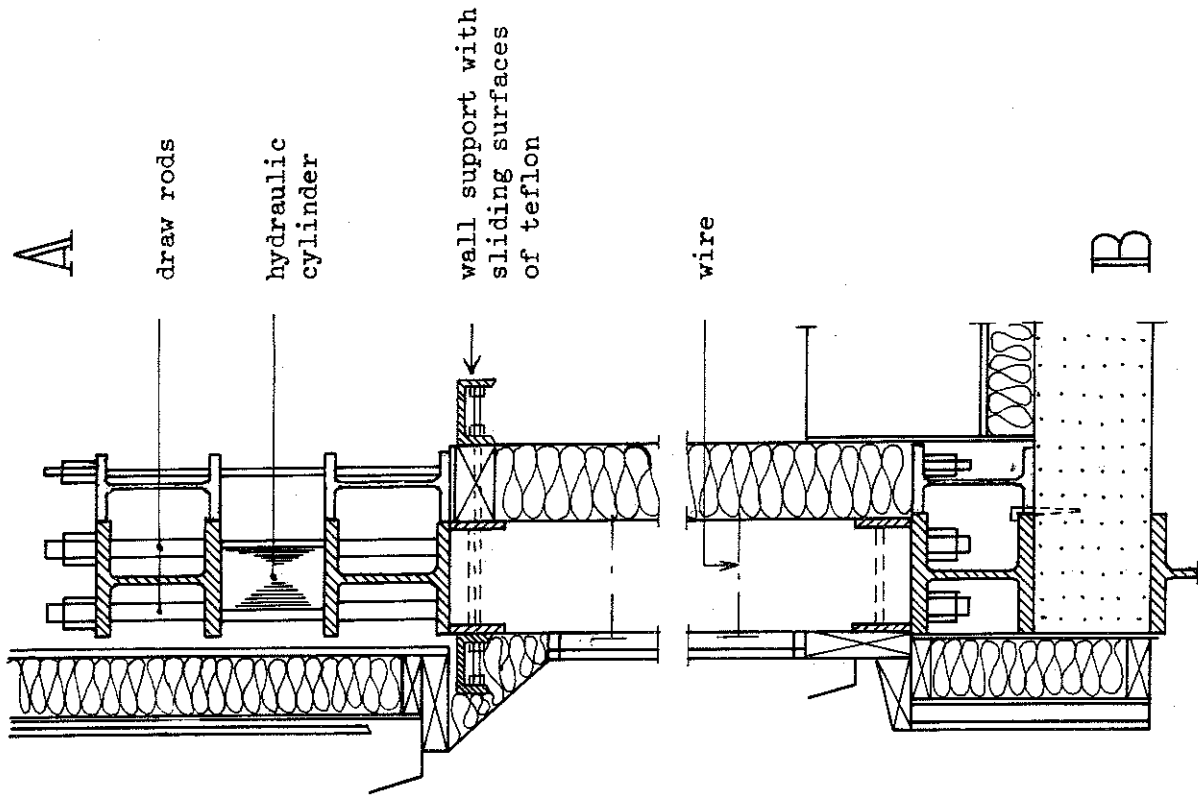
Test house II, vertical cross section b-b with hydraulic loading arrangements. Scale 1:30 and 1:10 (details A and B)
